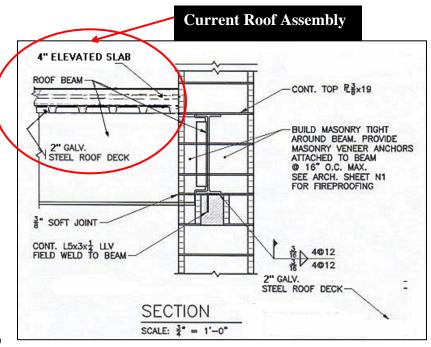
Original Structural Design (3" Galvanized Roof Deck)
